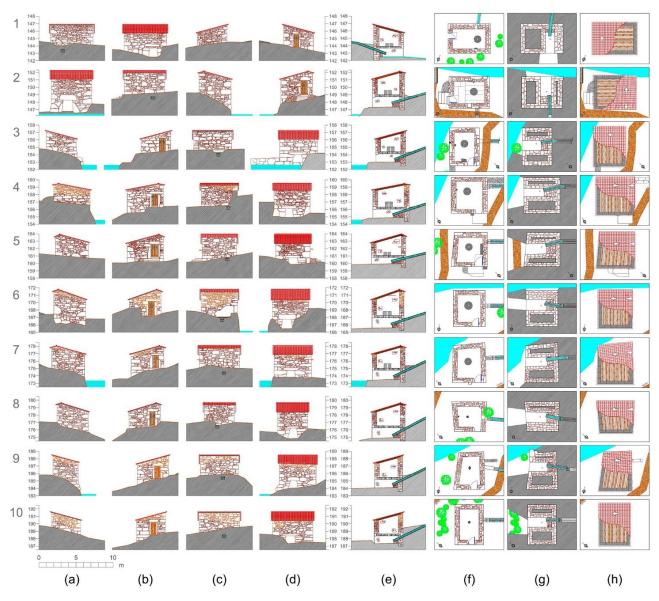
2D Reconstruction: a) North elevation; b) South elevation; c) East elevation; d) West elevation; e) Section; f) Milling room plan; g) Lower chamber plan; h) Roof plan.
